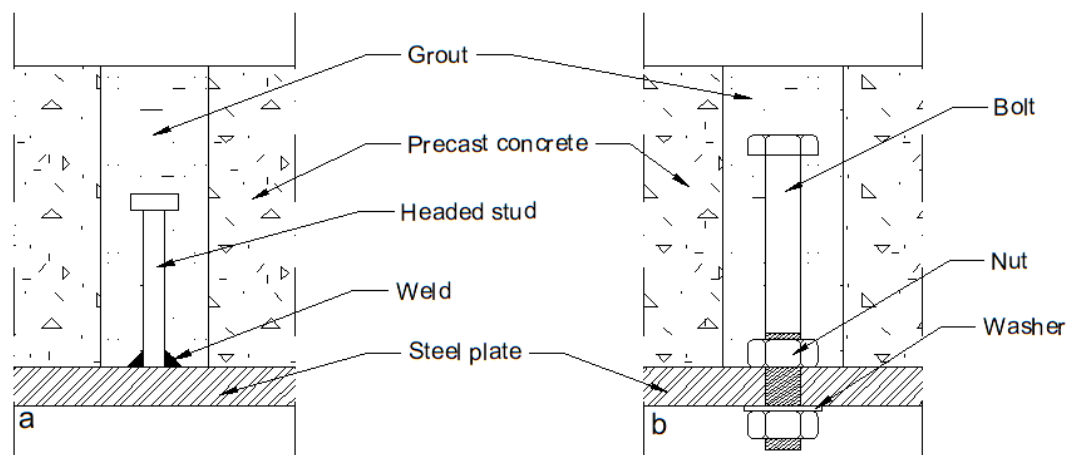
a) Welded headed stud shear connector; b) Demountable bolted shear connector
